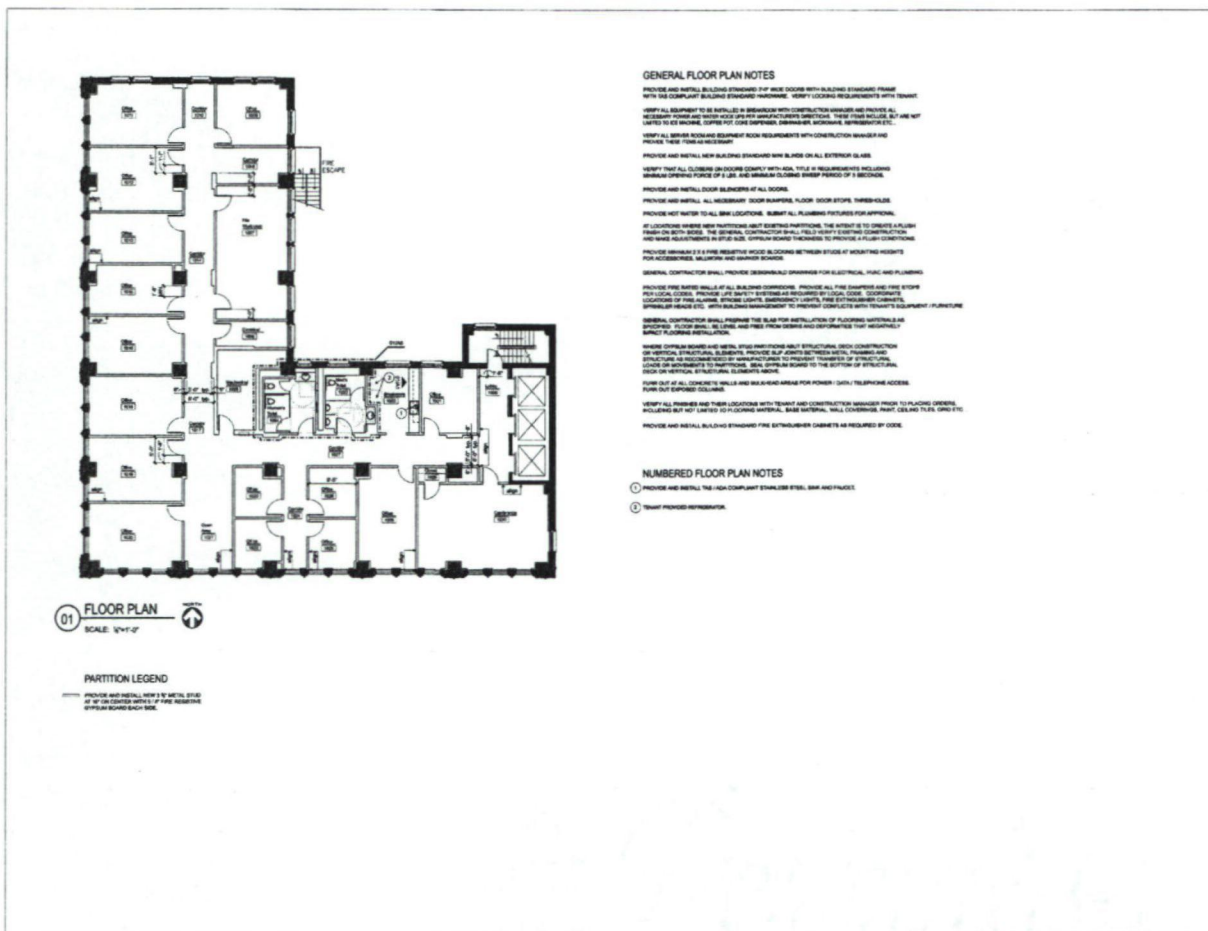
Petroleum Building, First Floor Plan [No title block]. Provided by XTO Energy, 2009.
